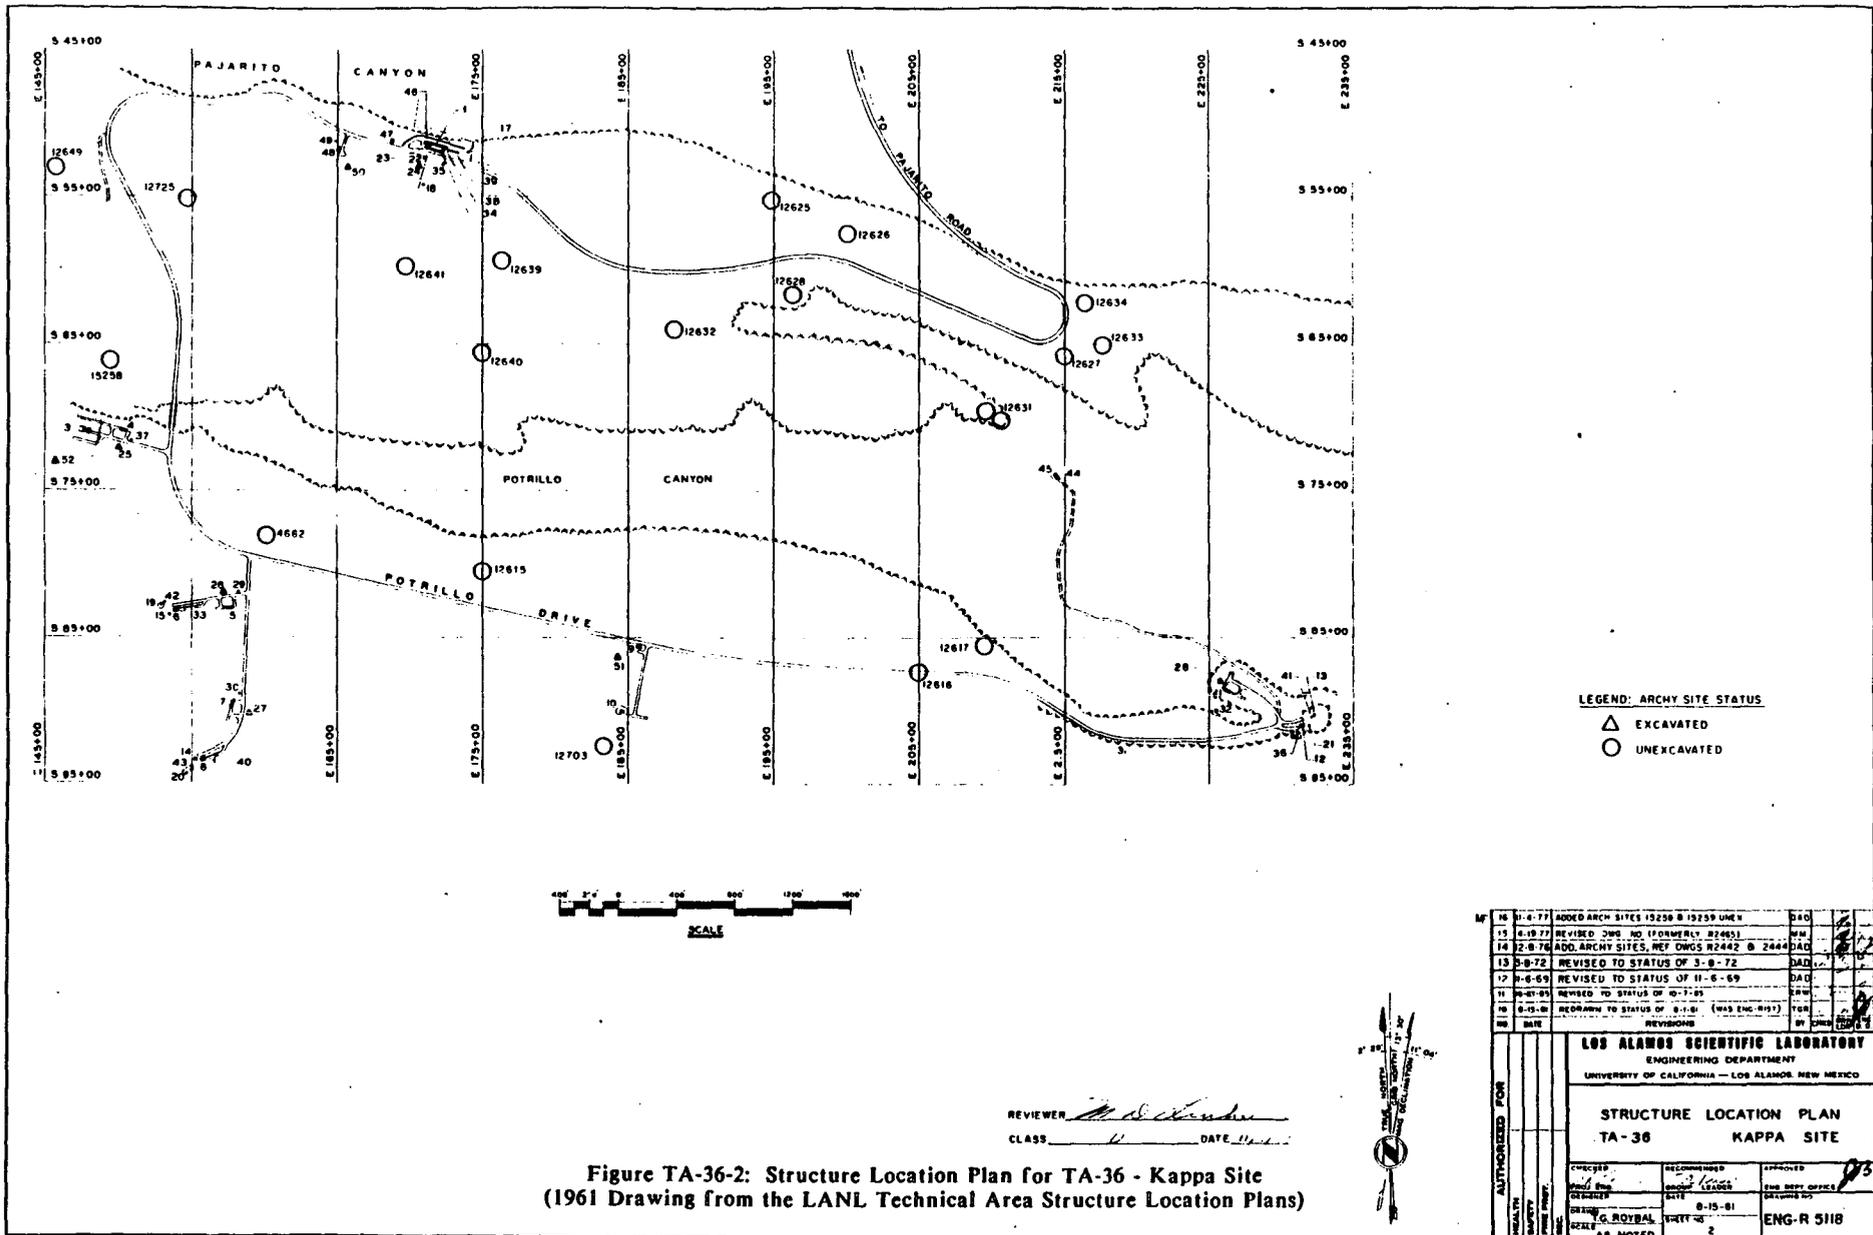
Structure Location Plan for TA-36 - Kappa Site
